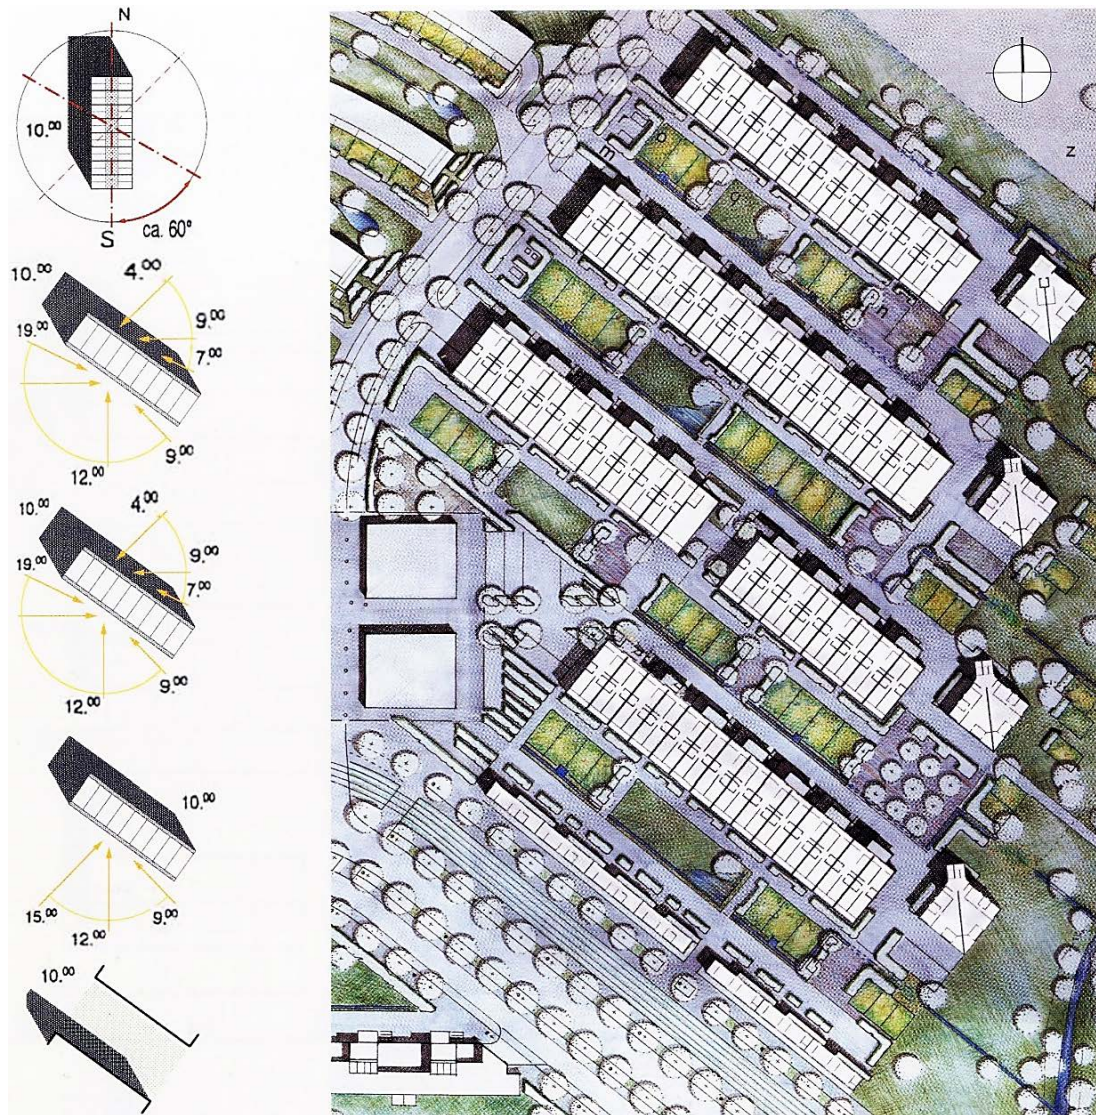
Solar city, Linz. Slender & Linear block and Point blocks, Site Plan
